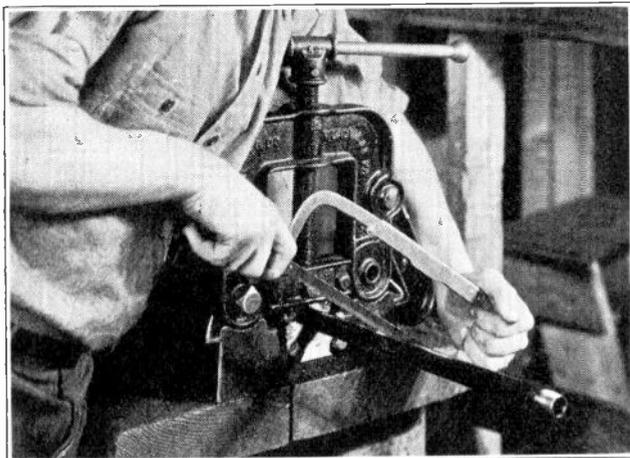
Cutting a piece of rigid conduit with a hack saw. It should always be cut squarely as otherwise it is difficult to properly ream and thread it.
